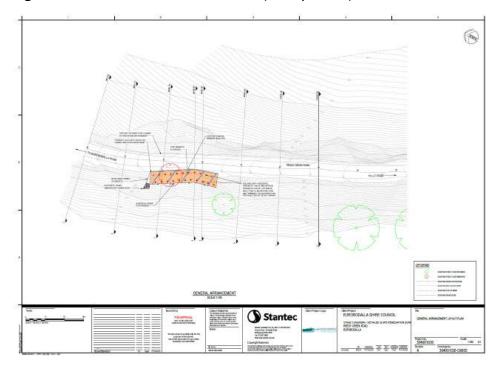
Detailed design for site AG00294 (Reedy Creek).
